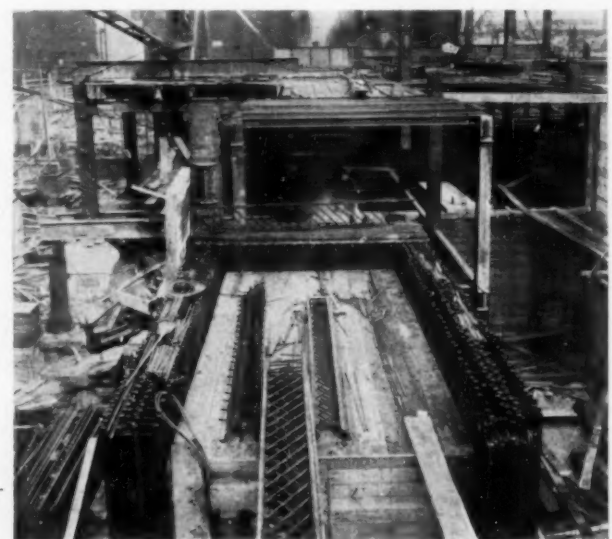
Vault Under Construction, Showing Vertical Reinforcing
